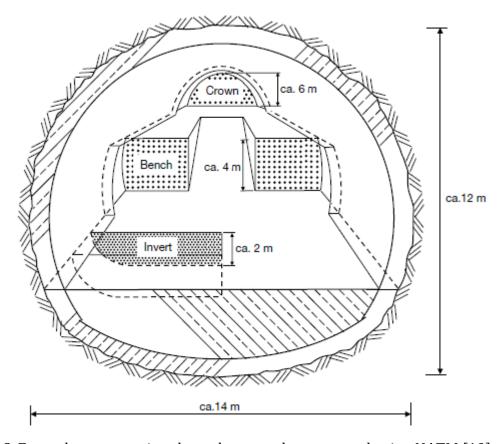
Example cross section through a tunnel constructed using NATM [10].
